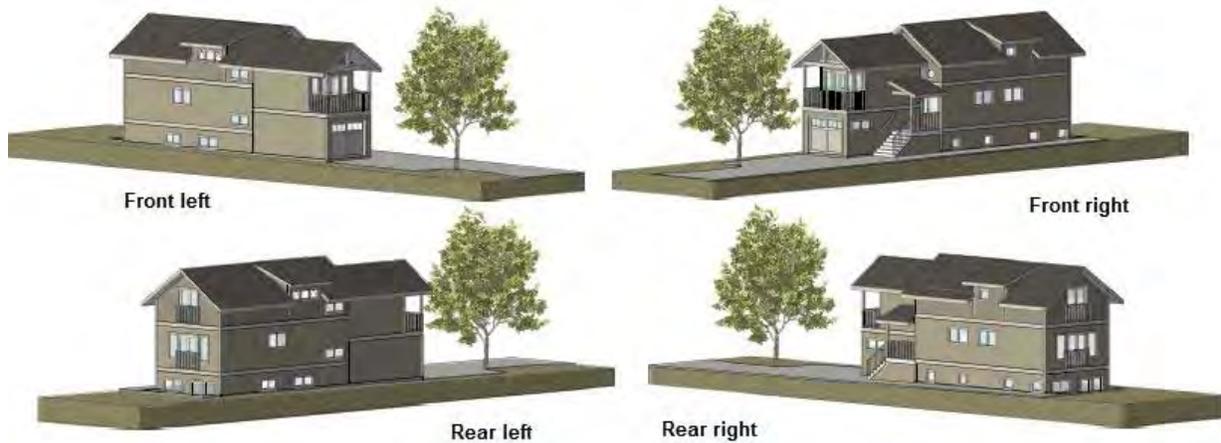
Conceptual Dwelling Design Proposed Lot B (Plans prepared by Cumming Design)
